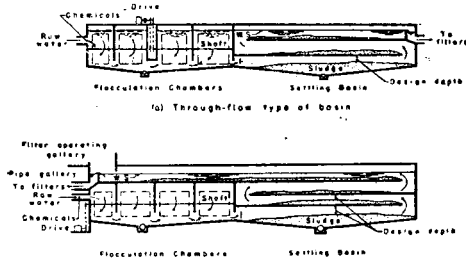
Suggested design for primary tanks without mechanical sludge removal
